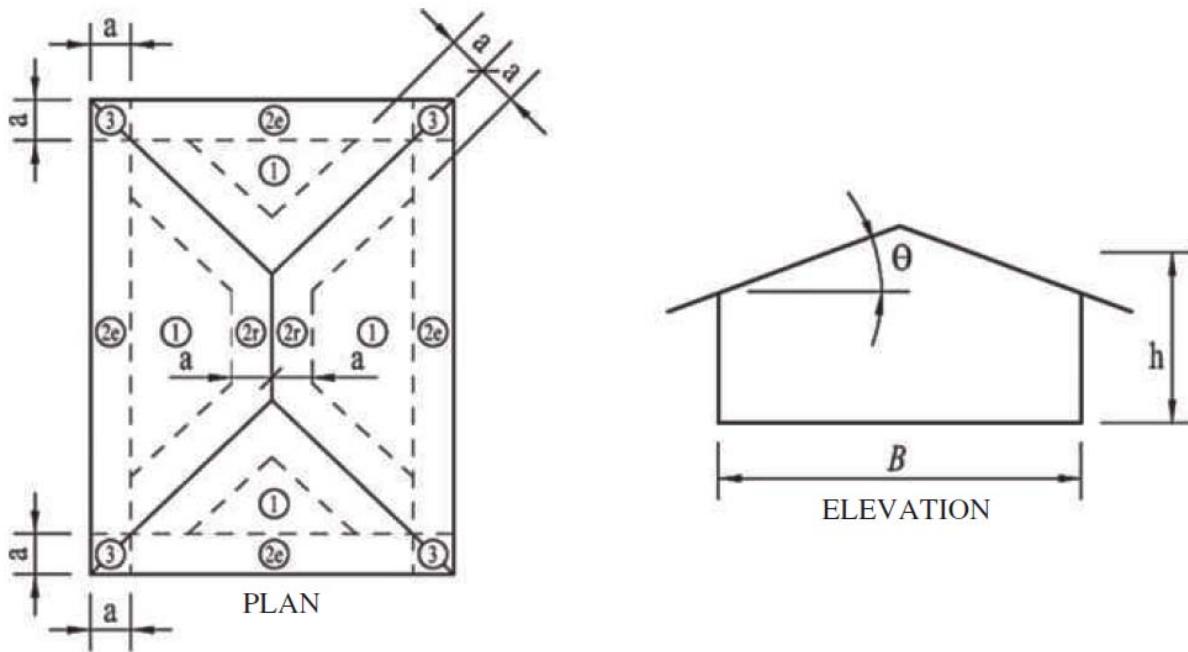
Roof Zones for Hip Roof Slopes Between 7 and 45 degrees
